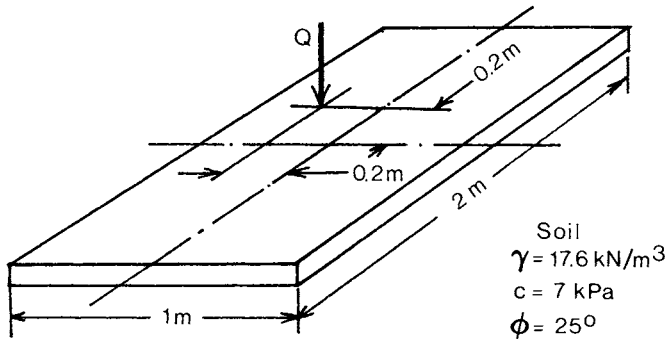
A footing with eccentric loading for Problem 3.3.
